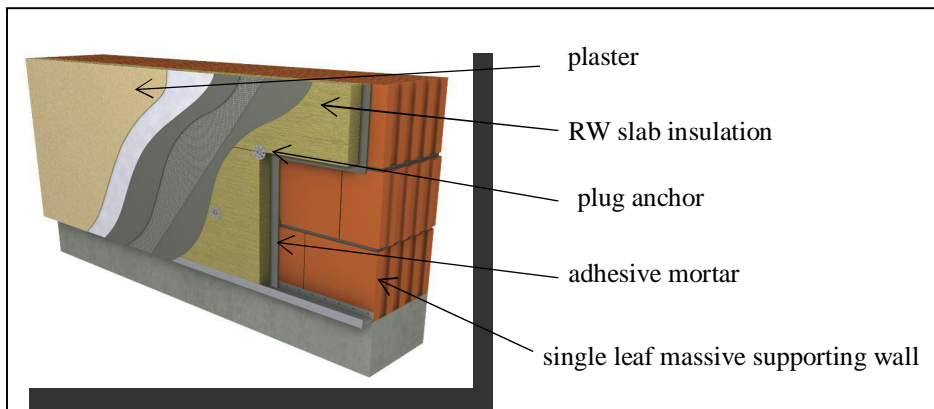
Detailed build-up of an originally single leaf massive external wall provided with plastered RW slab thermal insulation system II. (MÉS Z, 2012).
